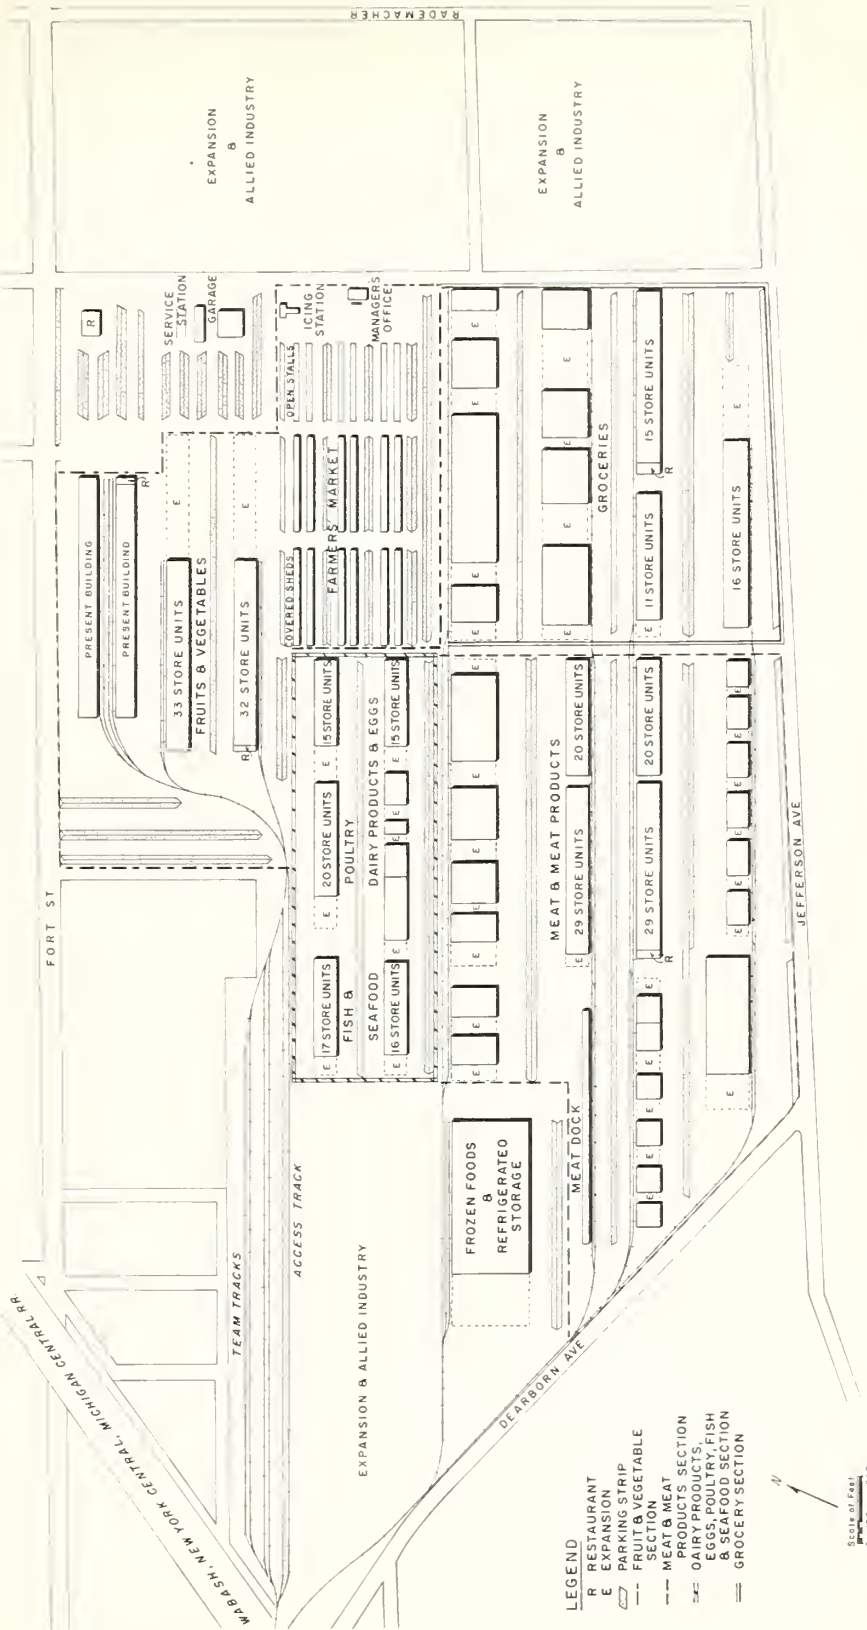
A layout of facilities for a wholesale food-distribution center on the Produce Terminal site.
